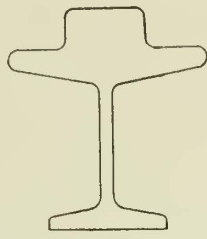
CENTRE BEARING GIRDER RAIL.
